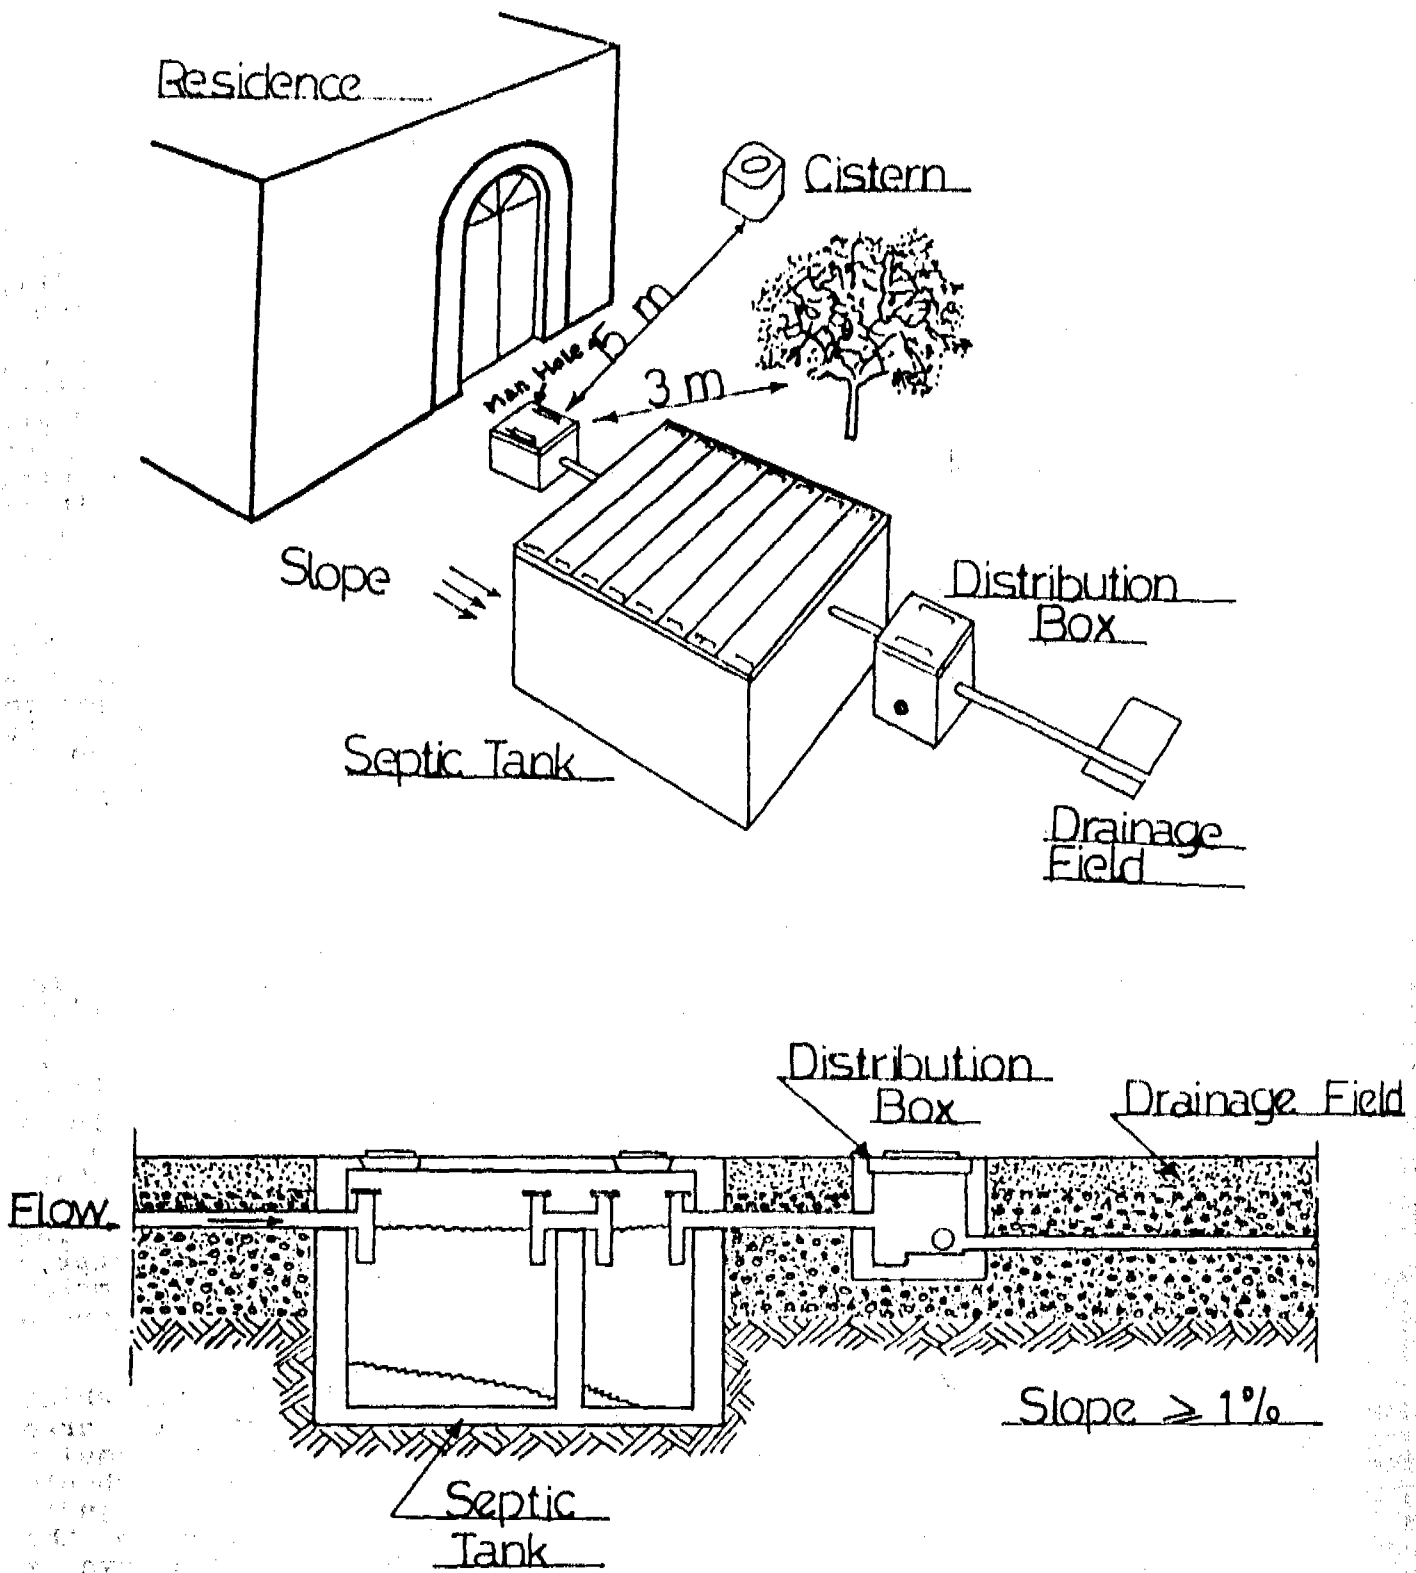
TYPICAL DETAILS OF THE SUBSURFACE DRAINAGE TECHNIQUE
